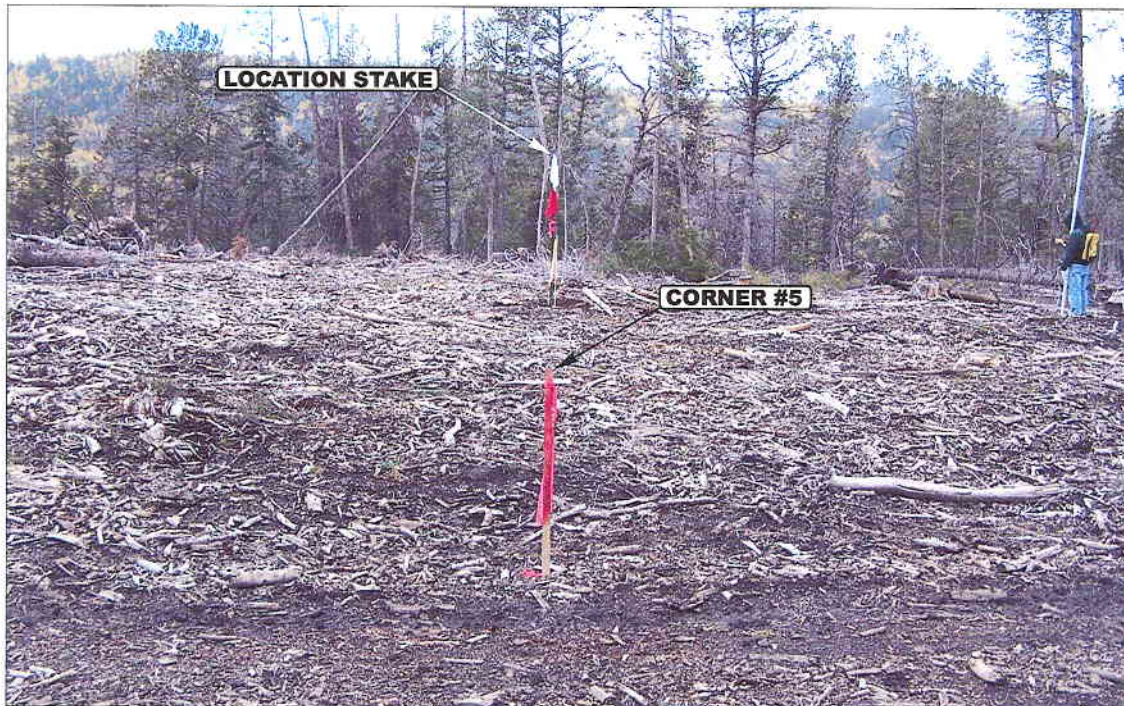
PHOTO: VIEW FROM CORNER #5 TO LOCATION STAKE
